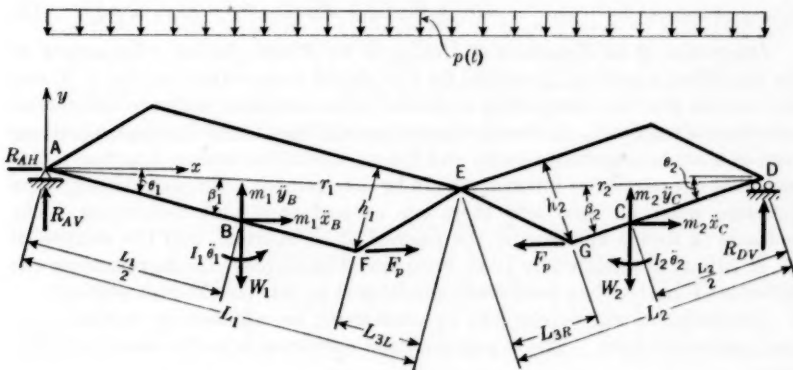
GEOMETRY OF TRUSS BRIDGE UNDERGOING FLOW IN A BOTTOM CHORD MEMBER
